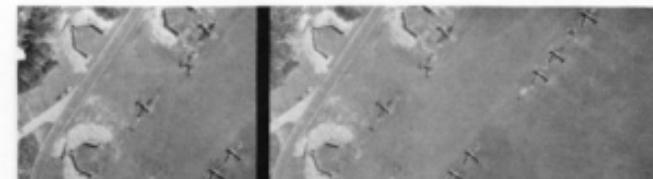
Revetments under construction. Wooden walls are being reinforced with earth. Openings 60 feet. Sovzone, Germany. Scale 1:2,800
